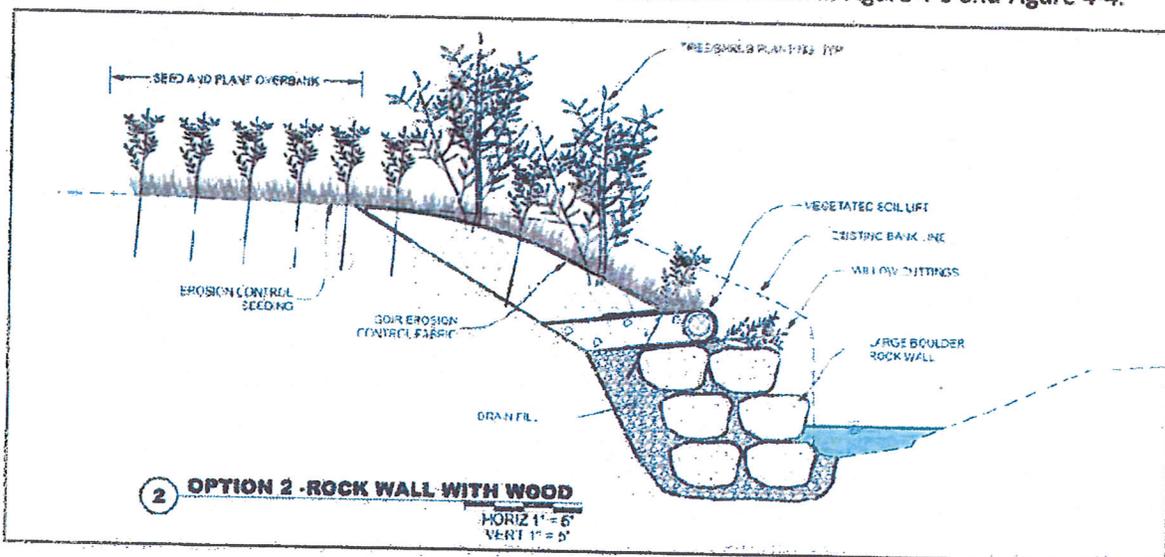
Schematic of rock wall toe and upper slope planting alternative.
